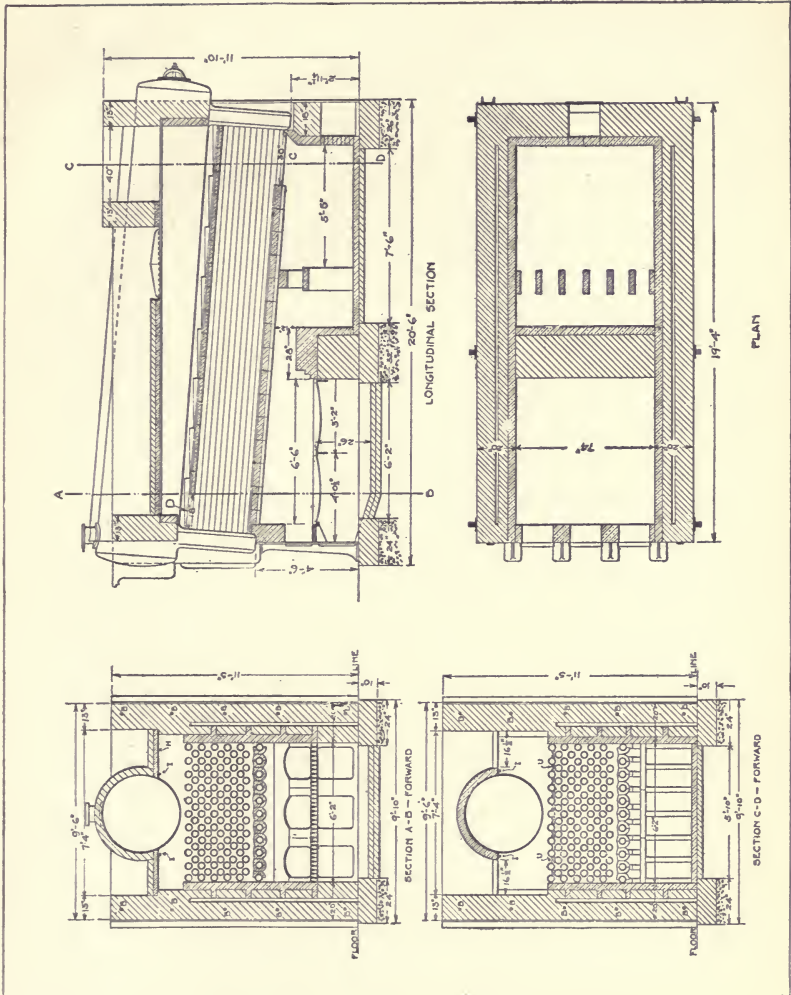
PLAN AND ELEVATION OF BOILER AND SETTING (PROFESSIONAL PAPER 48, p. 307)
